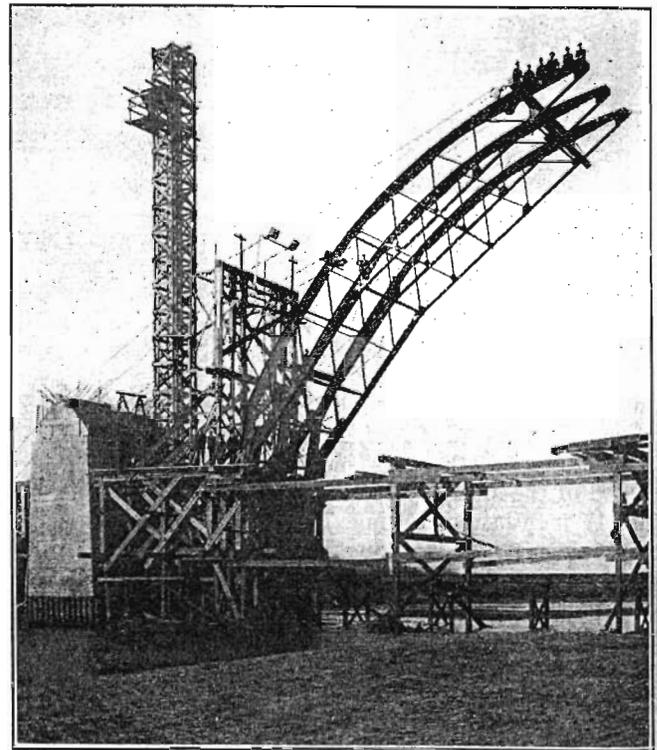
RAISING STEEL CENTERS FOR 212-FT. SPAN
